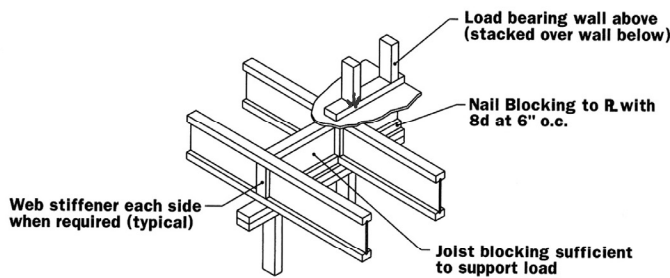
Continuous I-Joist Over a Bearing Wall Supporting a Wall Above
